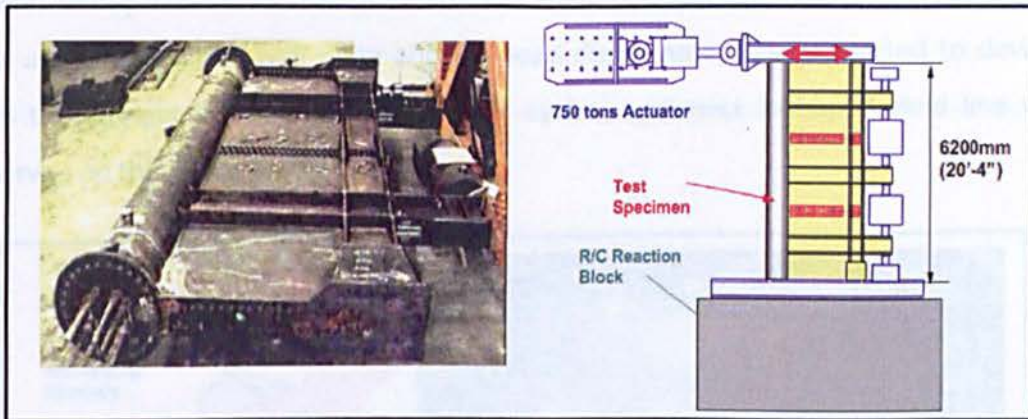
Test specimen and scheme of test set-up (Astaneh-Asl and Zhao, 2000)
